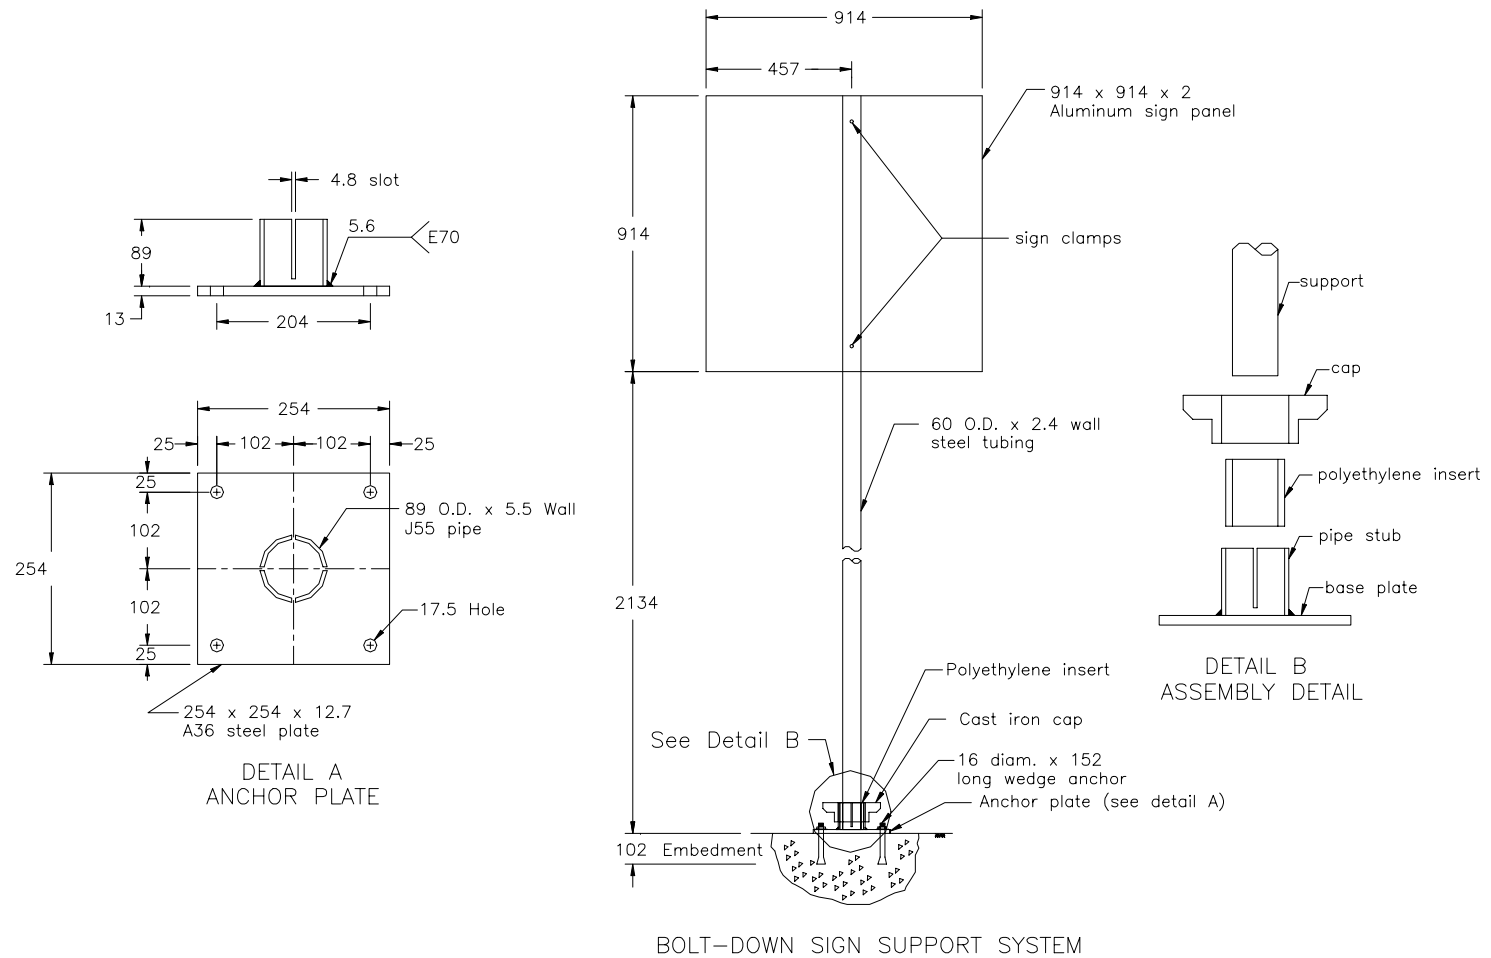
Details of the Installation Used for Evaluation of Support Bases Bolted to Concrete Pavement in Test 439117-6.
